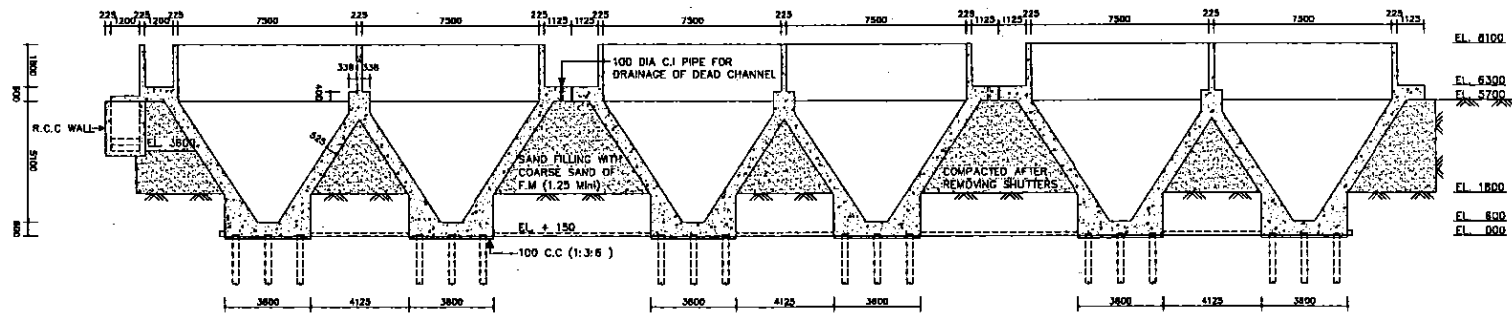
PLAN OF PROPOSED CLARIFIERS
